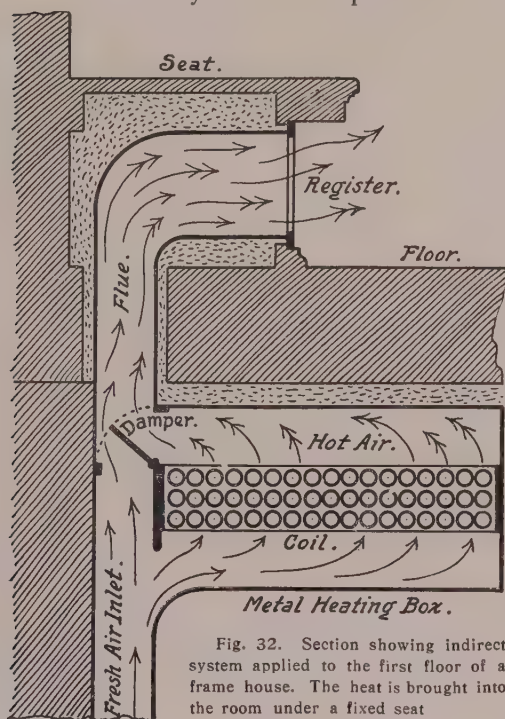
Section showing indirect system applied to the first floor of a frame house. The heat is brought into the room under a fixed seat
